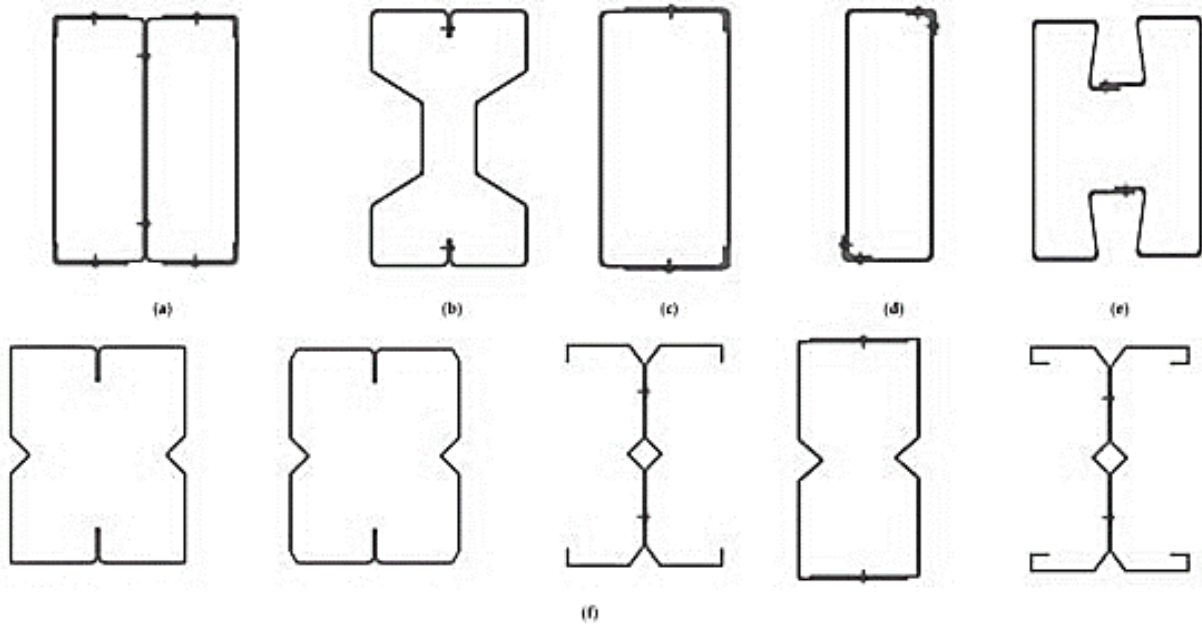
Cold formed steel built-up section with different shapes and stiffeners.
